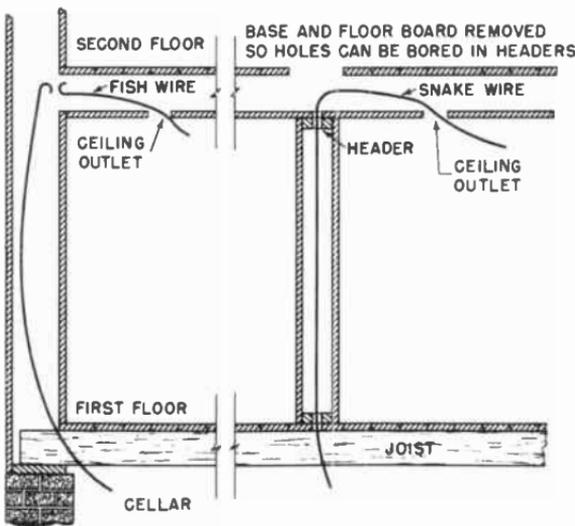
It is often possible to fish armored cable through wall spaces without making holes in the wall or removing baseboard.
